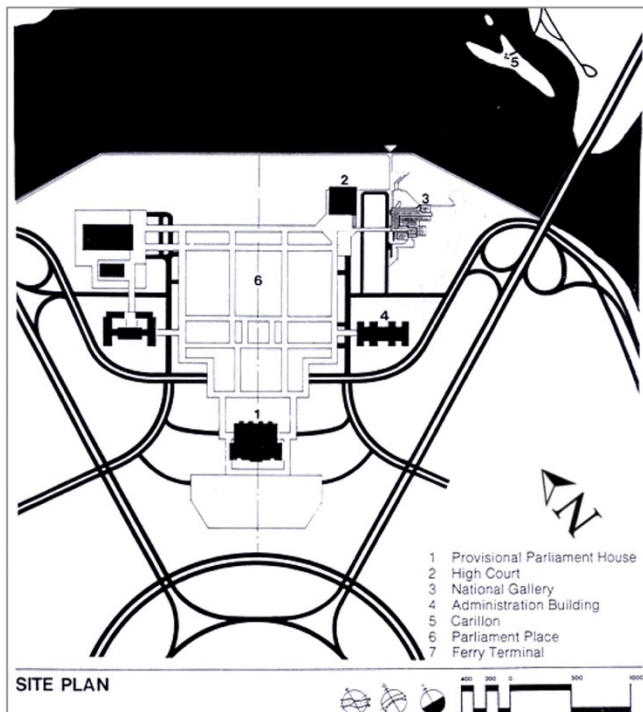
Parliamentary Zone plan showing proposed National Place, 1971
